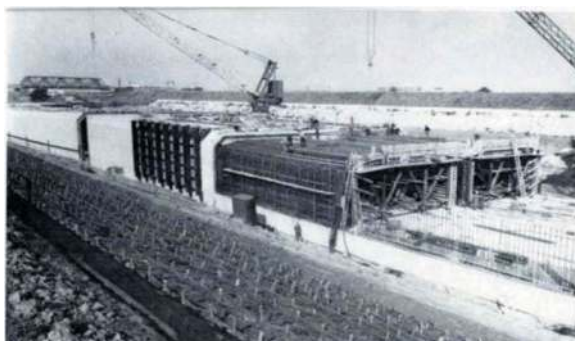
Vlakte tunnel, casting with no early-age cracking.
